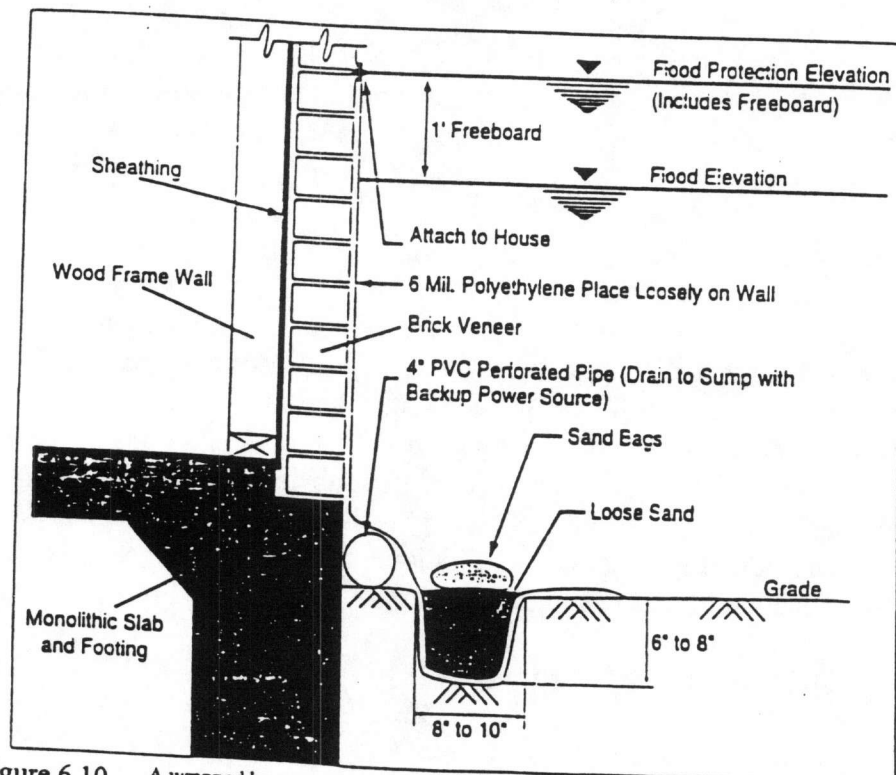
A wrapped house sealing system can be used to protect against low level flooding.
